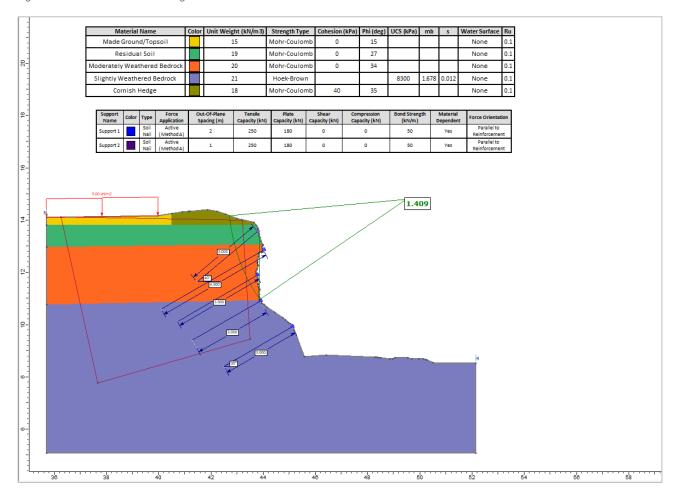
Section 3 – Soil Nailing - BS8006 Set2
